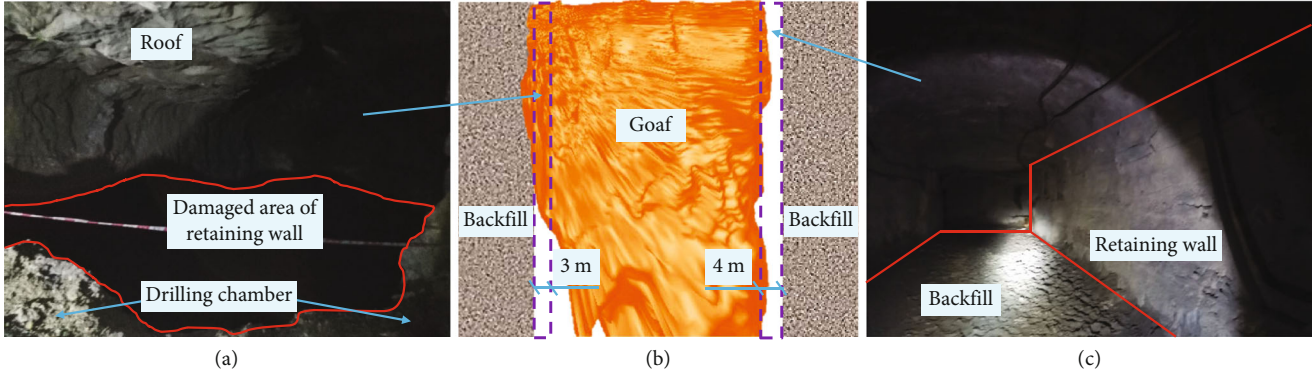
Shapes of goaf and retaining wall after the second-step mining: (a) retaining wall with a thickness of 3 m collapsed, (b) scanning results of the goaf, and (c) retaining wall with a thickness of 4 m remained fairly stable without collapsing.
